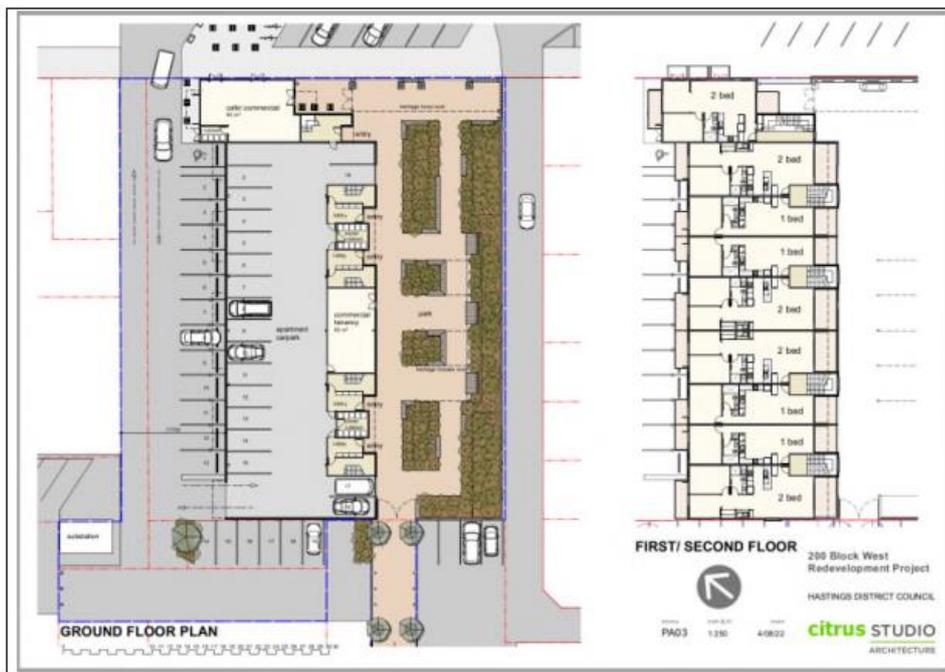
Site and Ground, First and Second Floor Layout Plans
